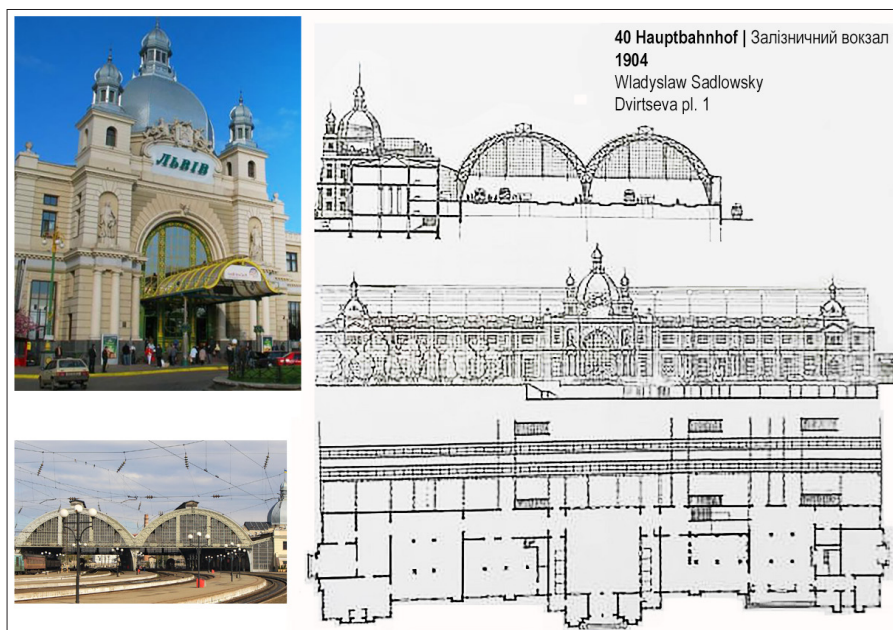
Modern view of the central risalit block and platform; section, facade, and plan of the first (entrance) level of the Lviv Main Railway Station
